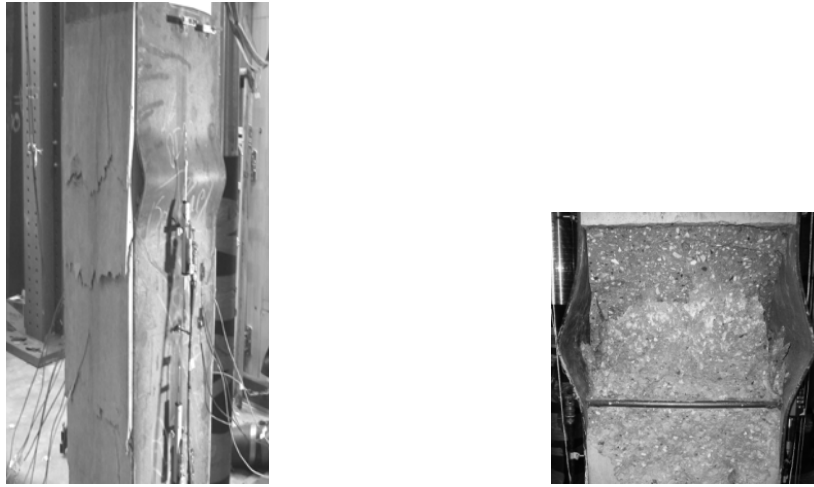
Failure Mode of Typical PEC Test Column (Chicoine *et al.* 2002).
